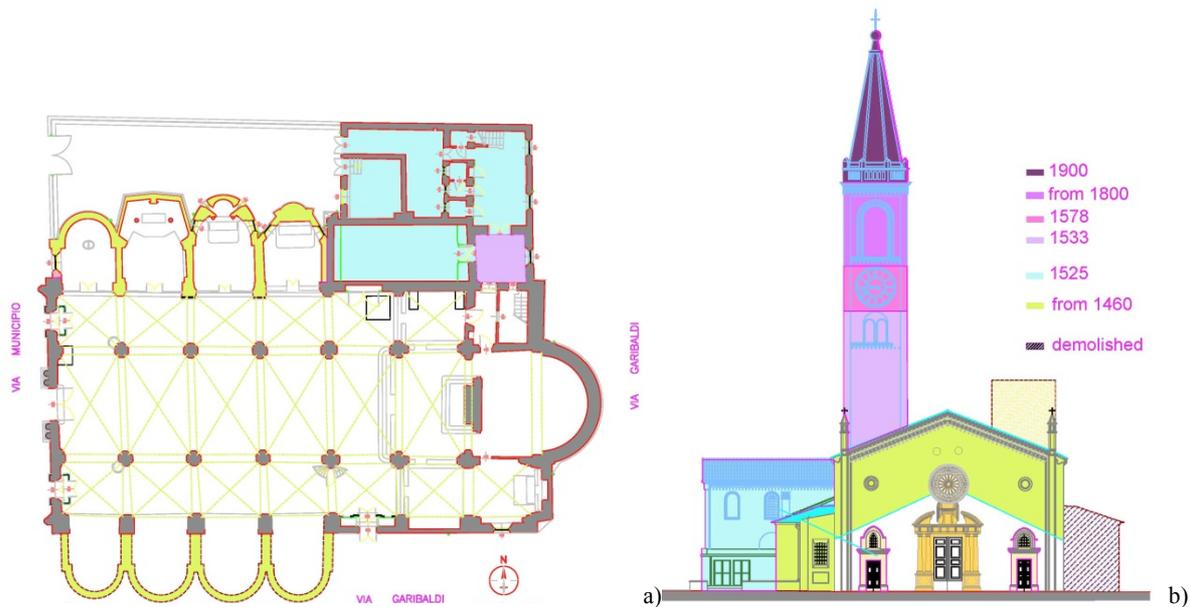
Historical evolution of the St. Bassiano church: a) plan and b) West facade view.
